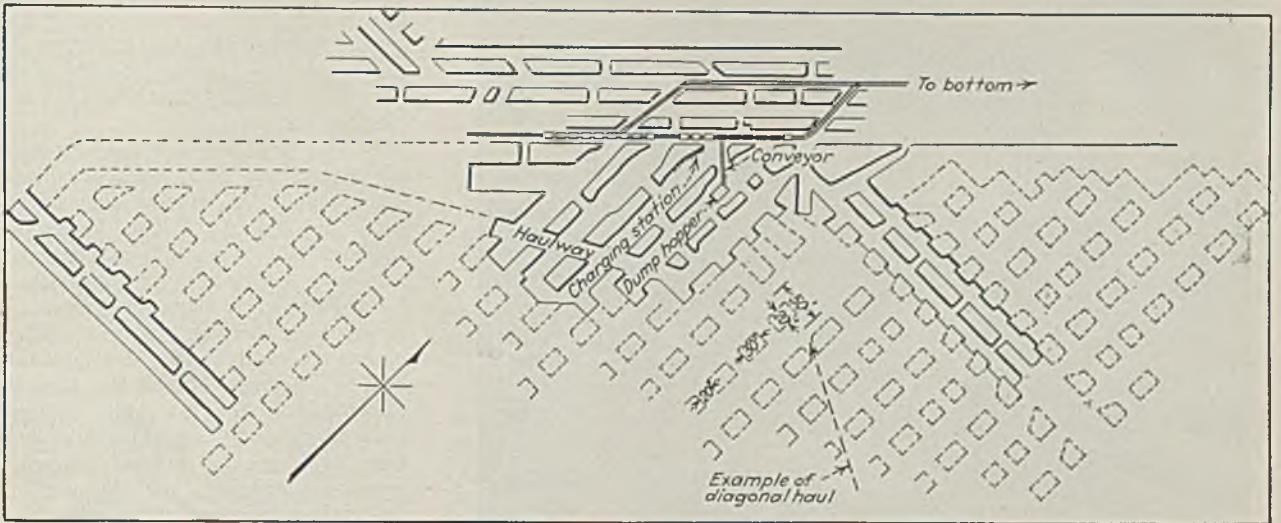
Modified "checkerboard" working plan used with rubber-tired haulage at Wick mine, showing also location of dump hopper and car-loading conveyor, as well as method of bringing in trips of cars for loading
